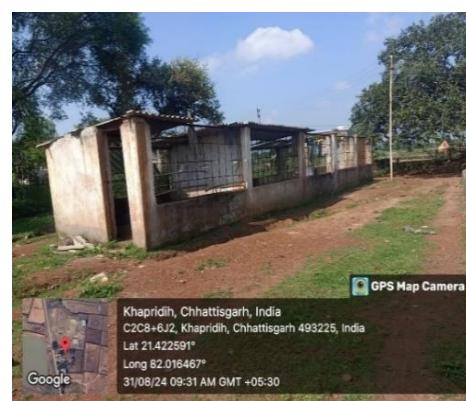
Khapridihkhurd, Raipur 31.08.2024
